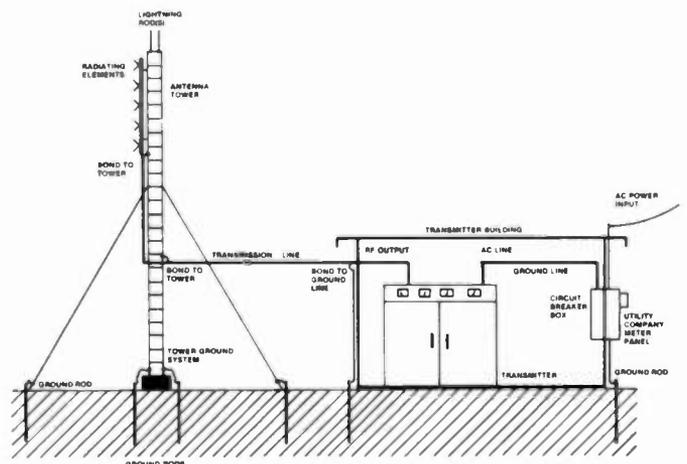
The typical, but not ideal, grounding arrangement for a transmission facility using a grounded tower. A better configuration involves the use of a bulkhead panel through which all cables into and out of the equipment building pass.
